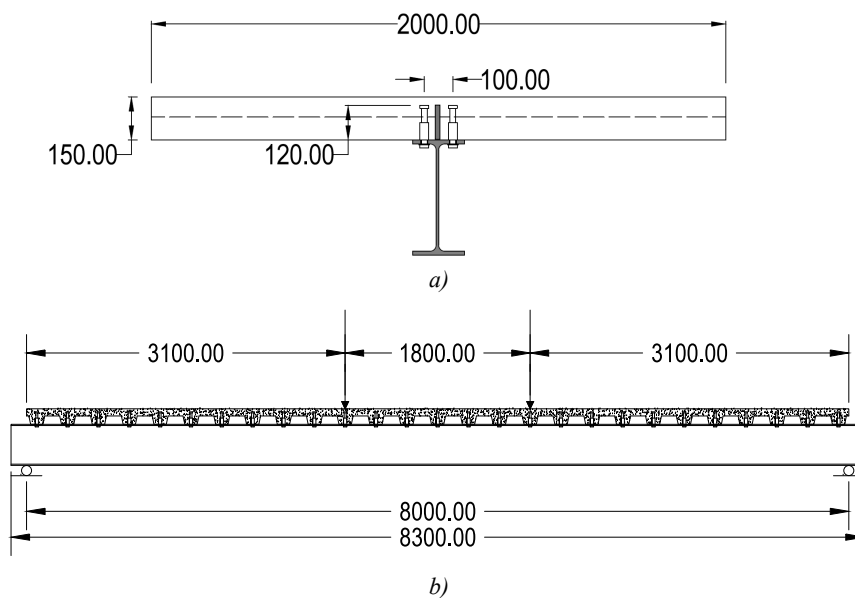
a) Cross-sectional view; b) Test layout (dimensions in mm)
